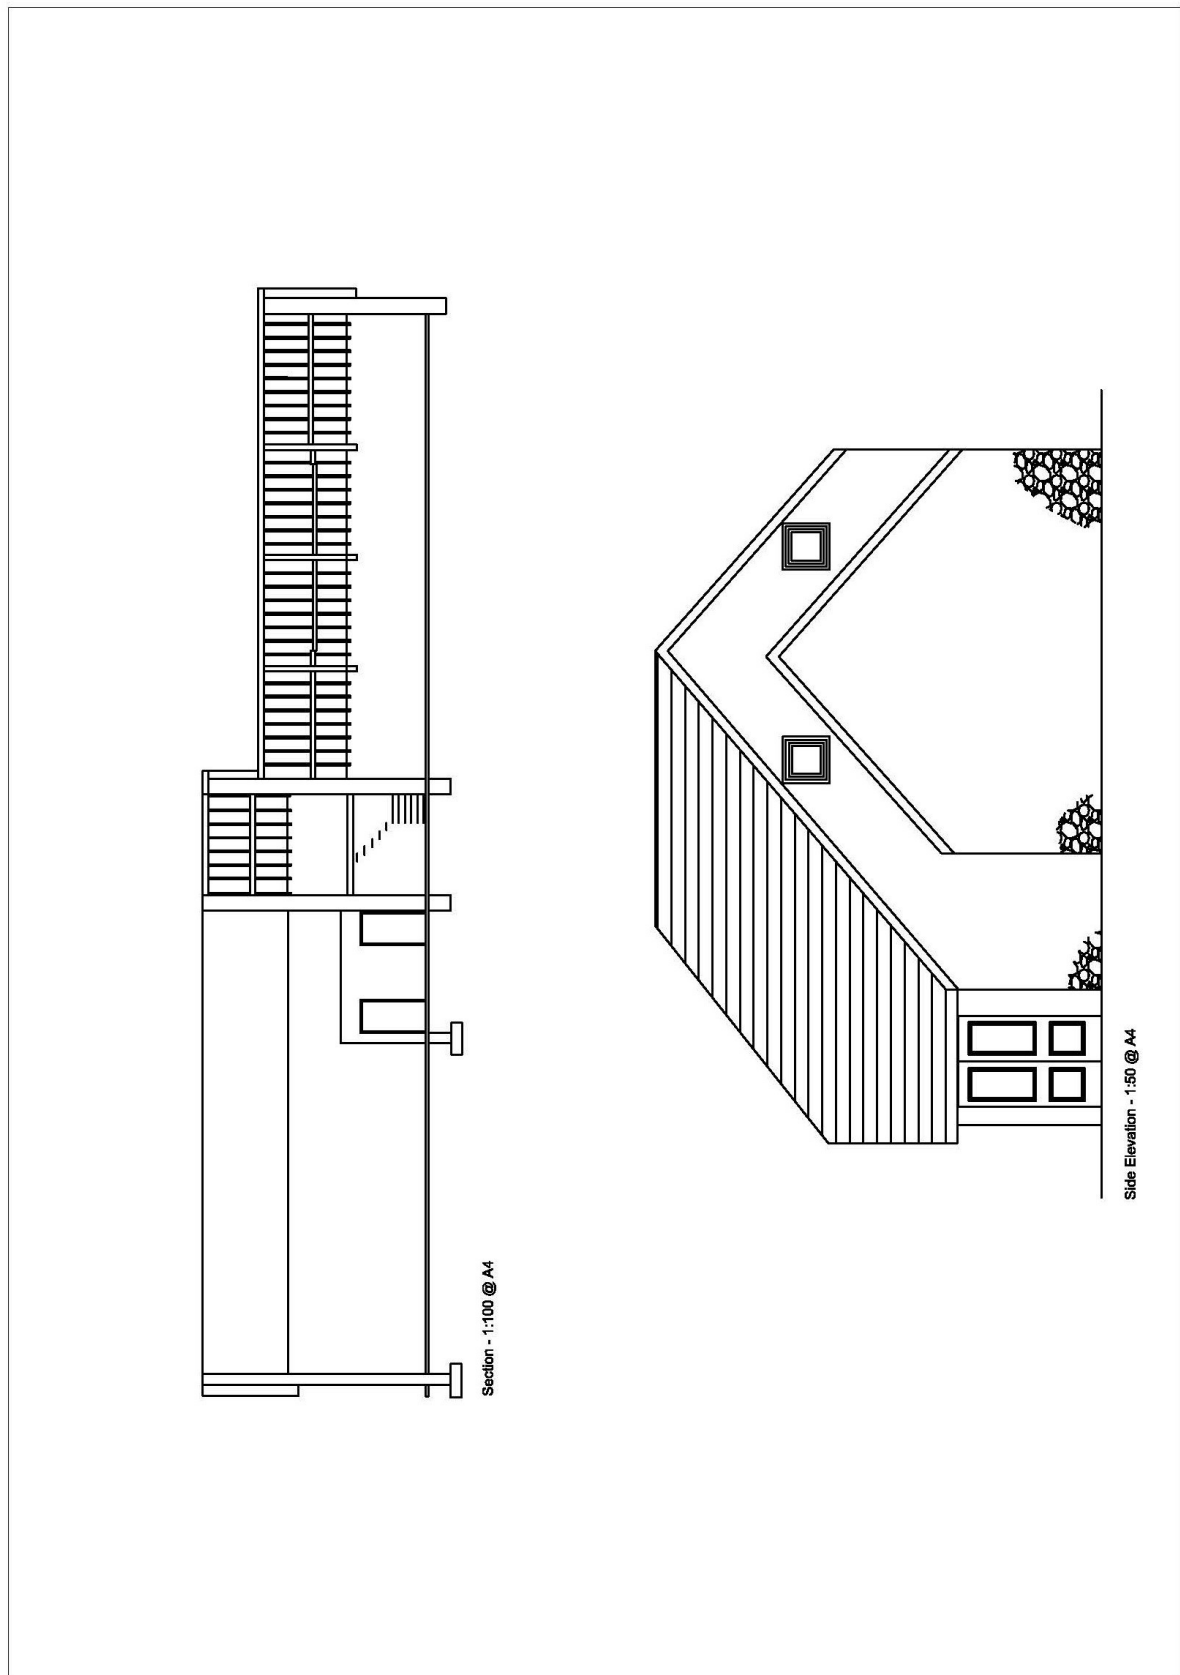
Longitudinal section through agricultural building and proposed extension, scale 1:100, and side elevation, scale 1:50@A4.Reproduced courtesy Bath Record Office
